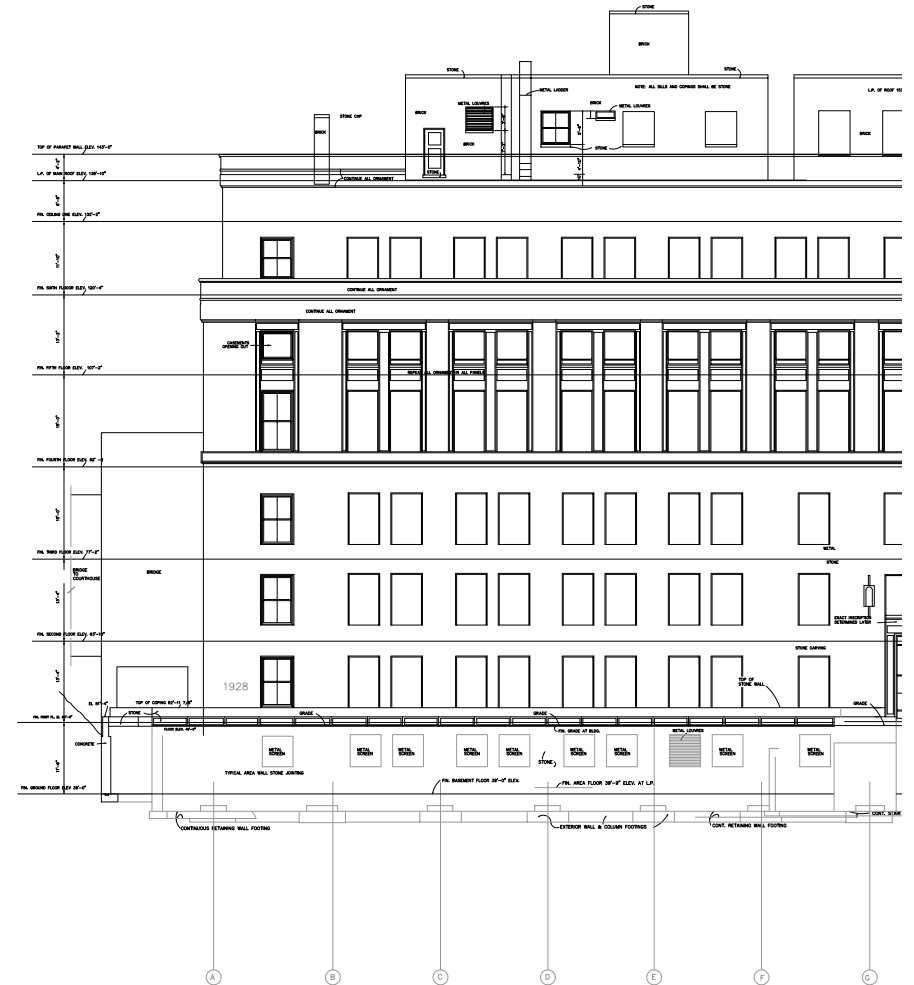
Partial Safety Building Elevation showing floor to floor heights
